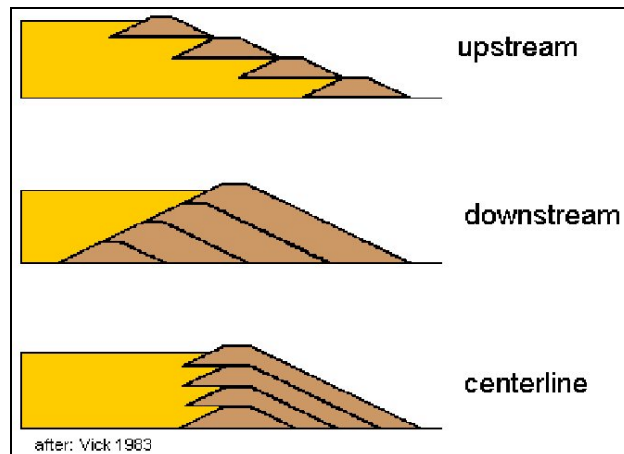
Types of sequentially raised dams with tailings in the structural zone [11, EPA, 1995]
